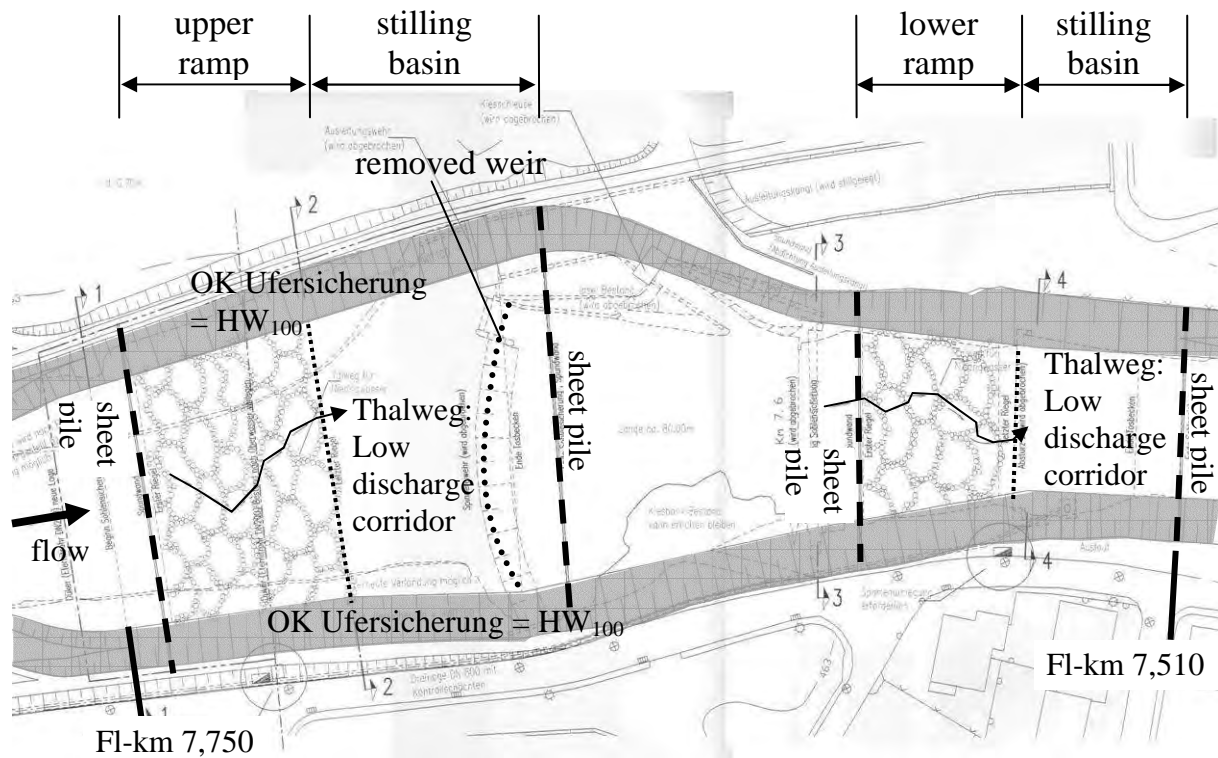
Sketch of the bottom ramp Kolbermoor in the river Mangfall, plan view
